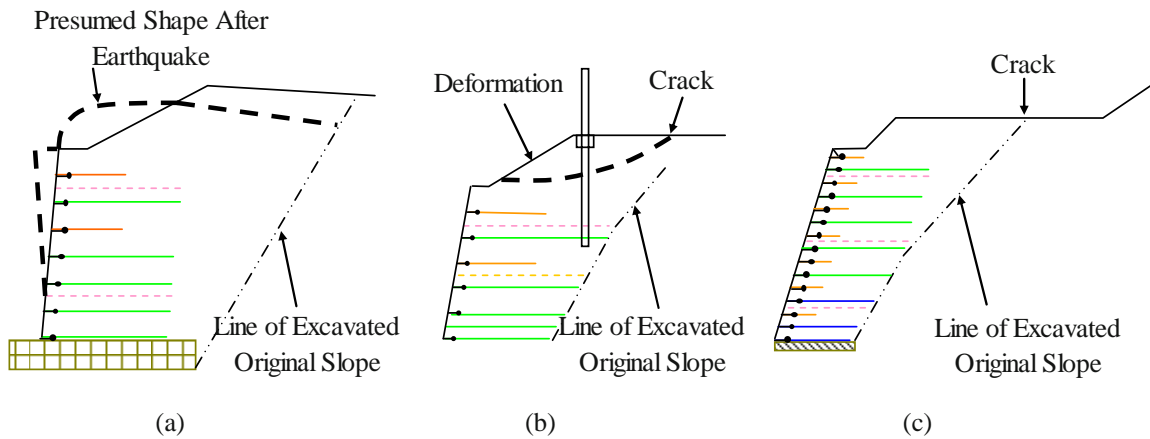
Simplified plans of geotextile reinforced soil retaining walls
